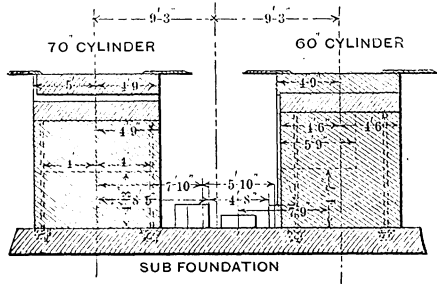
Cross Section Foundations of 3d and 4th Cylinders.
